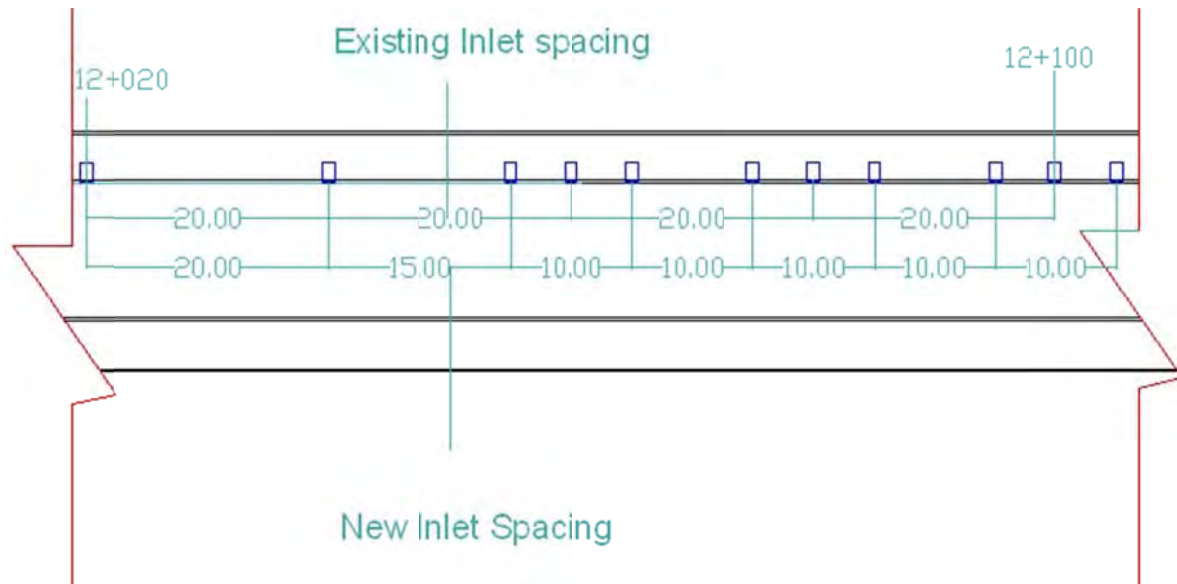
Existing and new computed inlet spacing at Saris – Gotera road.
